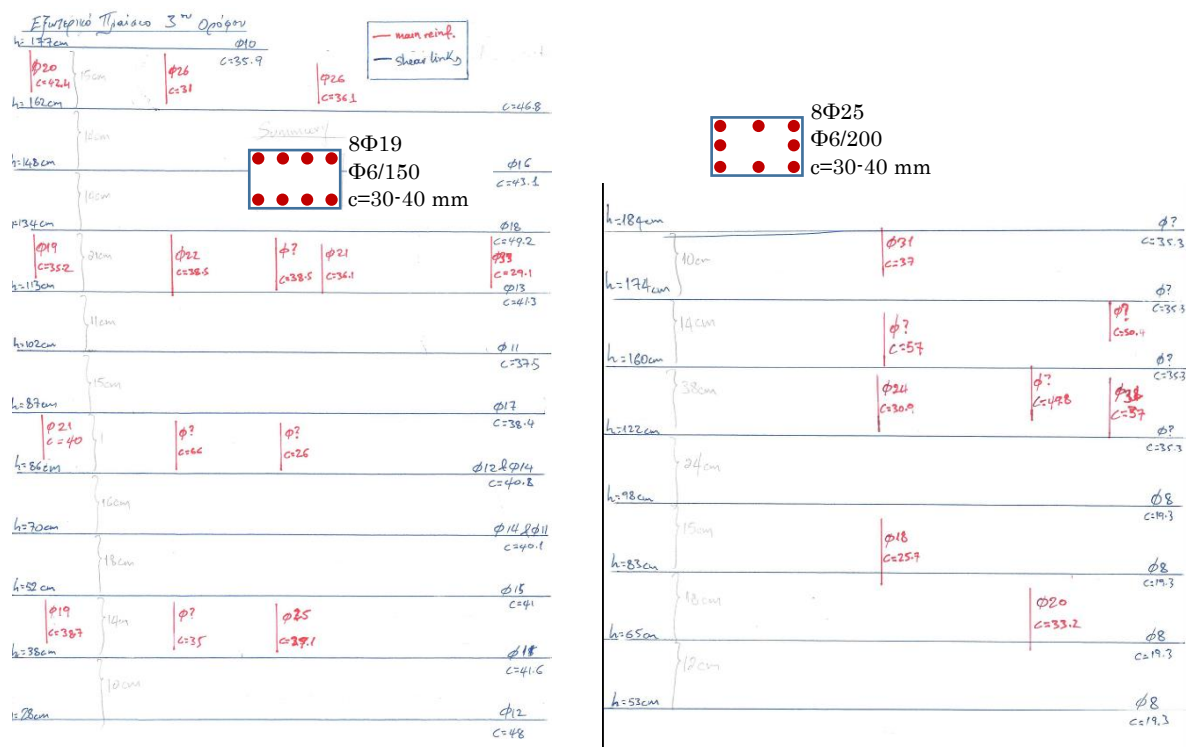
Reinforcement measurements on 3rd floor columns; external frame (left) and internal frame (right)
